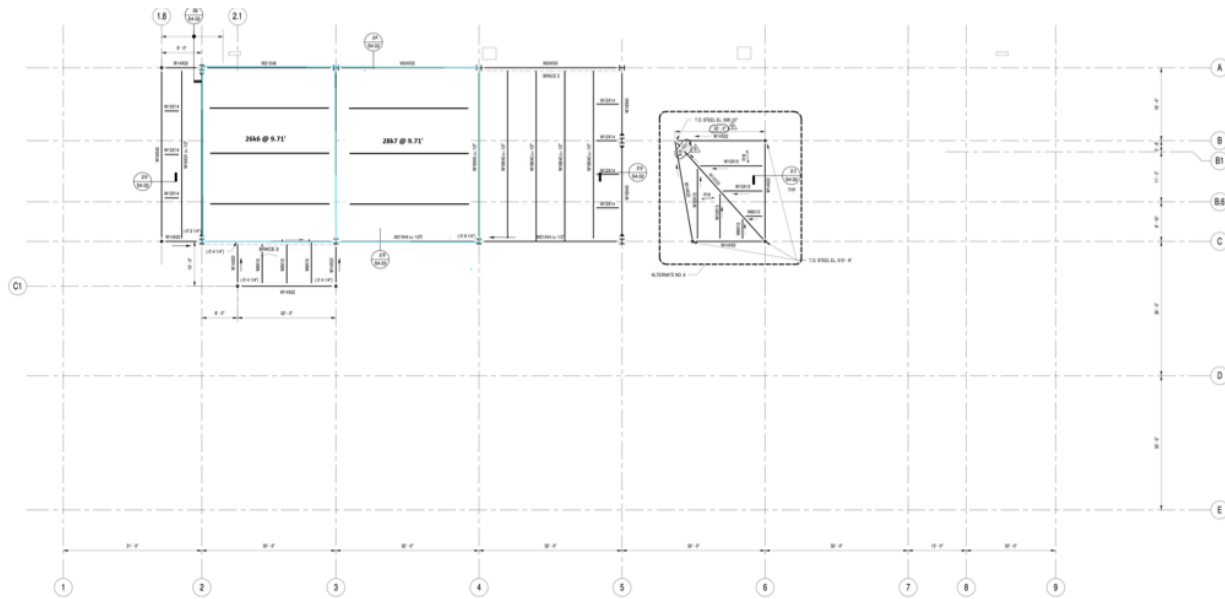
Mechanical Roof Layout of Open-Web Bar Joists
